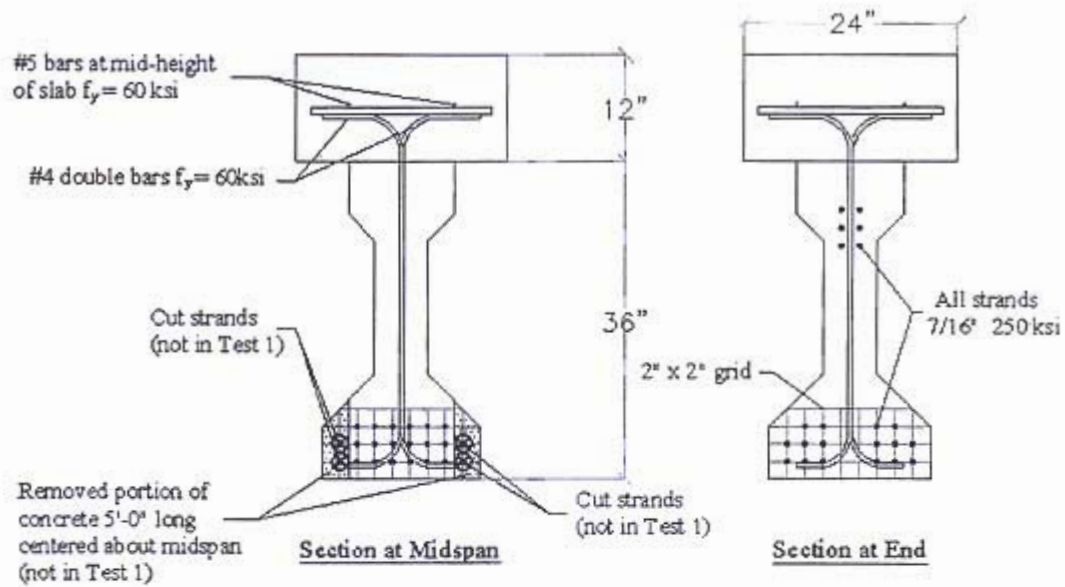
Typical Cross-Section Details for Test Specimens 2, 3, 4, 5, and 6
